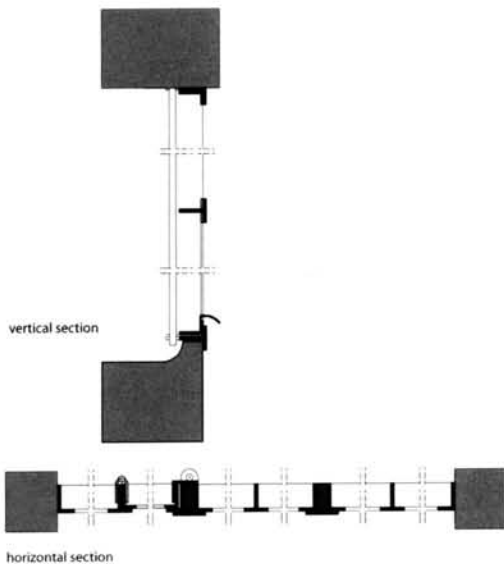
Atelier Ozenfant (1922). Plan and vertical section of the horizontal window on the 1st floor. The frames are formed of assembled standard angles and T-shapes. Thicker steel mullions support the casement bolt and strengthen the frame. Flat sheets screwed on this mullion reconstitute a rabbet. Drawing VF according to the working drawing FLC07830
